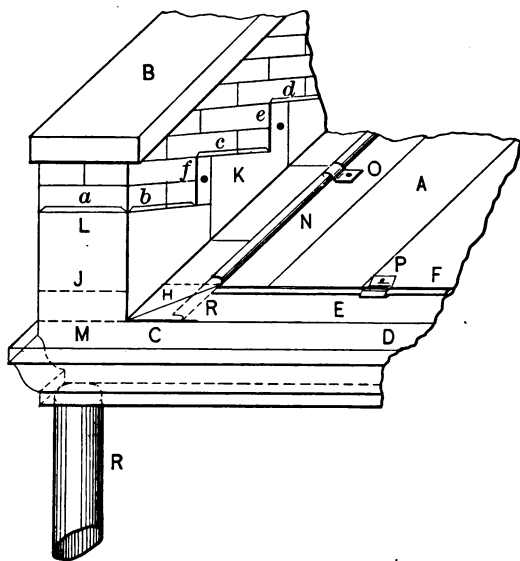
Putting in Step Flashings for Pitched Roof with Hanging Gutter.
